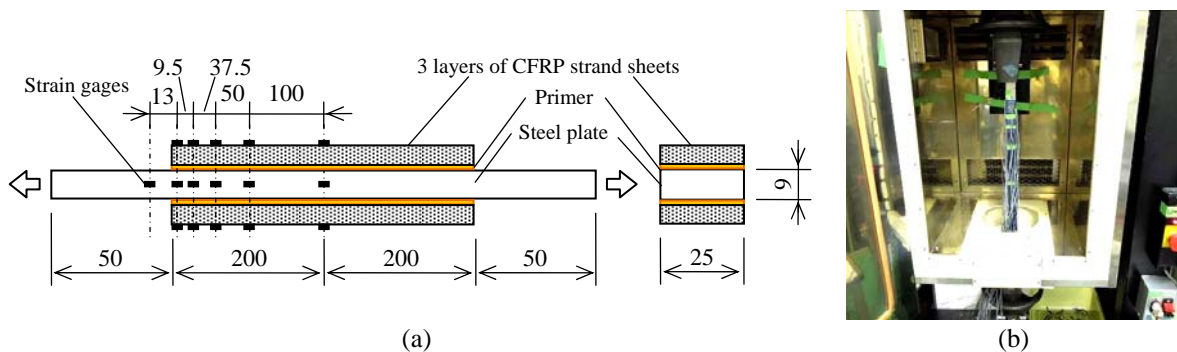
(a) Details of a tensile test specimen (b) Photograph of during testing
